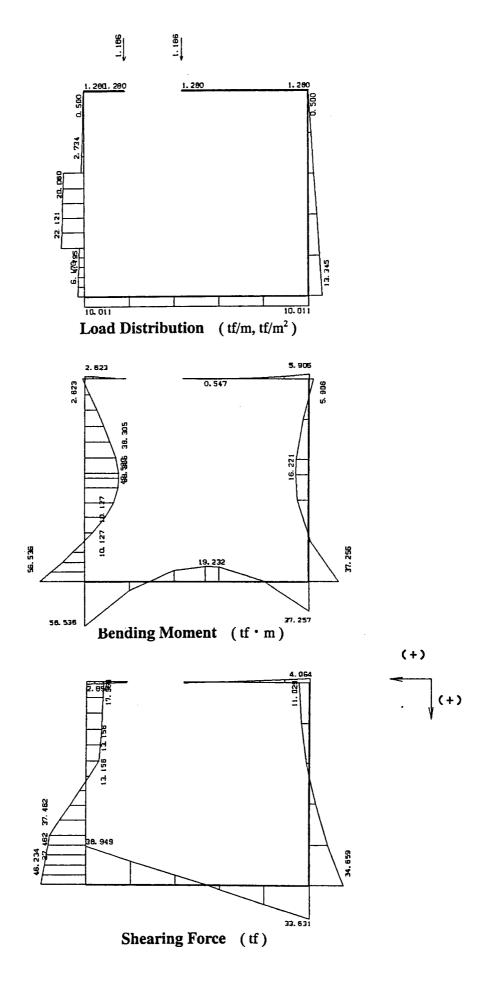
Load and Sectional Force of Case 1 (Upstream; Full)
